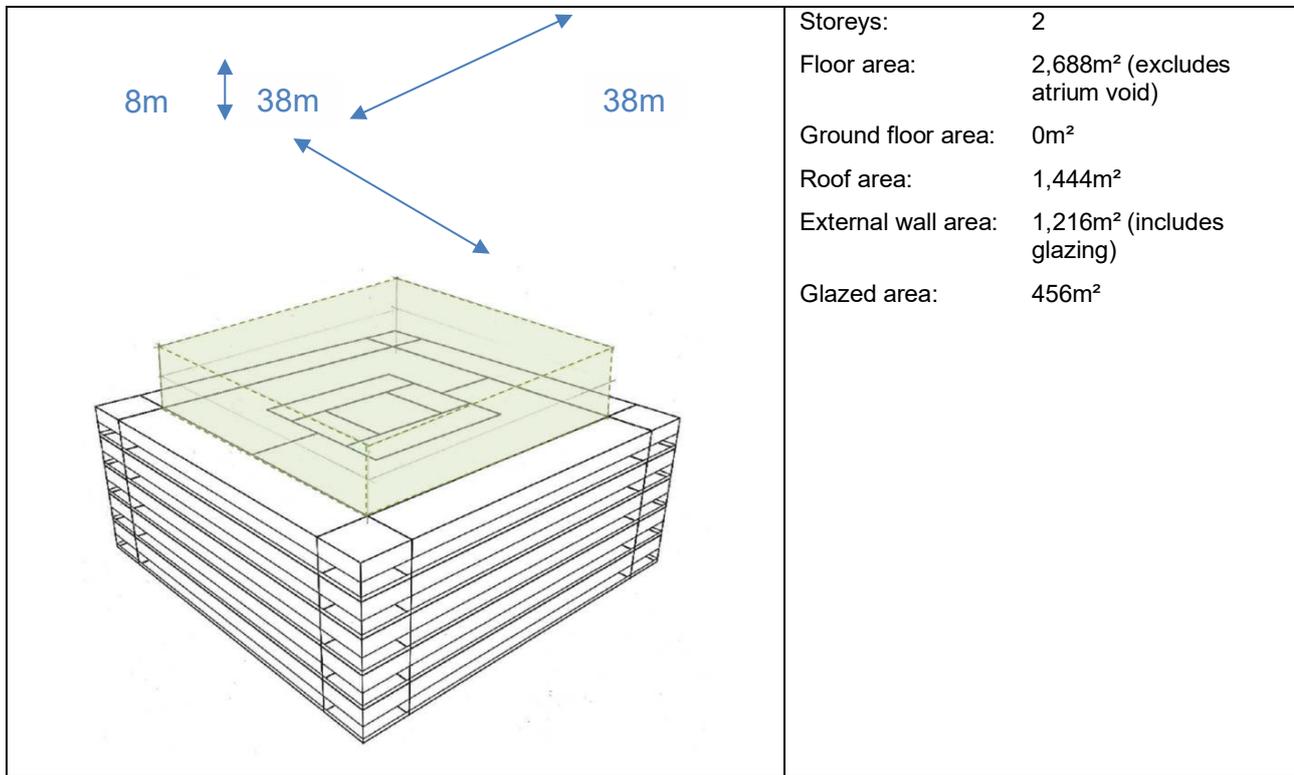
Sketch of the office building form used for the existing building modelling with an extension
